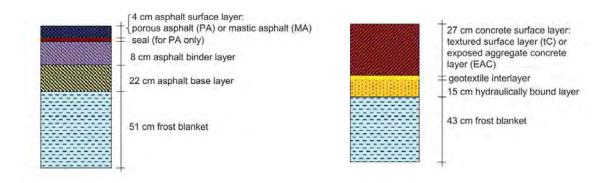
Schematic structure of an asphalt (left) and concrete (right) motorway (MILA-CHOWSKI et al., 2011)
